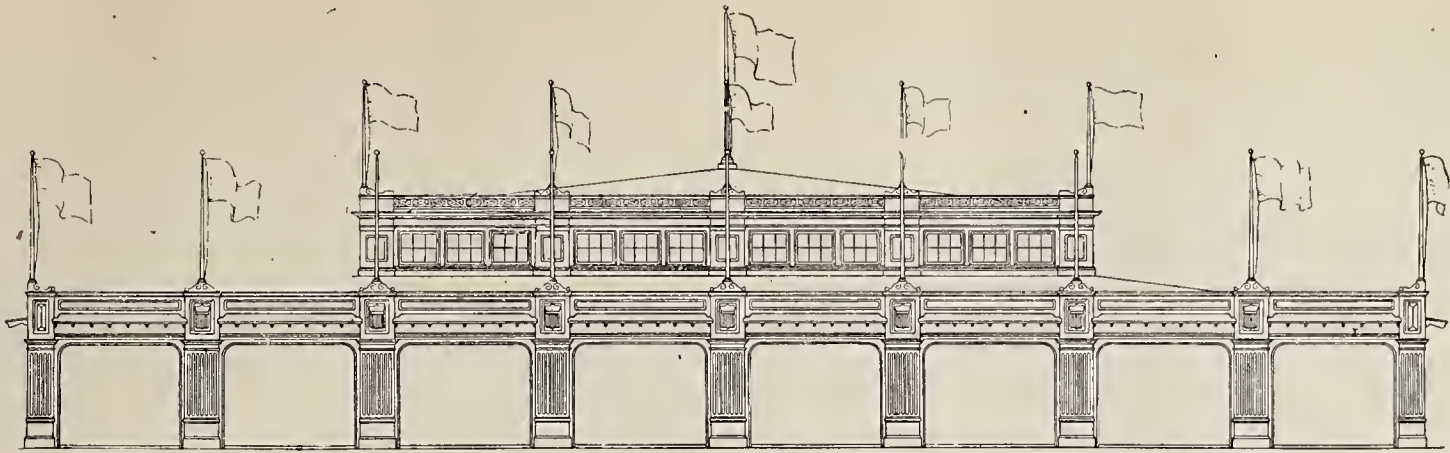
ELEVATION AMERICAN RAILWAY APPLIANCE EXPOSITION BUILDING, WASHINGTON, D. C.
